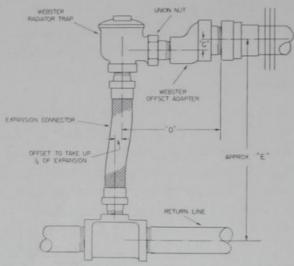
Webster Offset Adapter (sweat connection) and Trap with Expansion Connector for connection of Heating Element with coupling to return piping.
